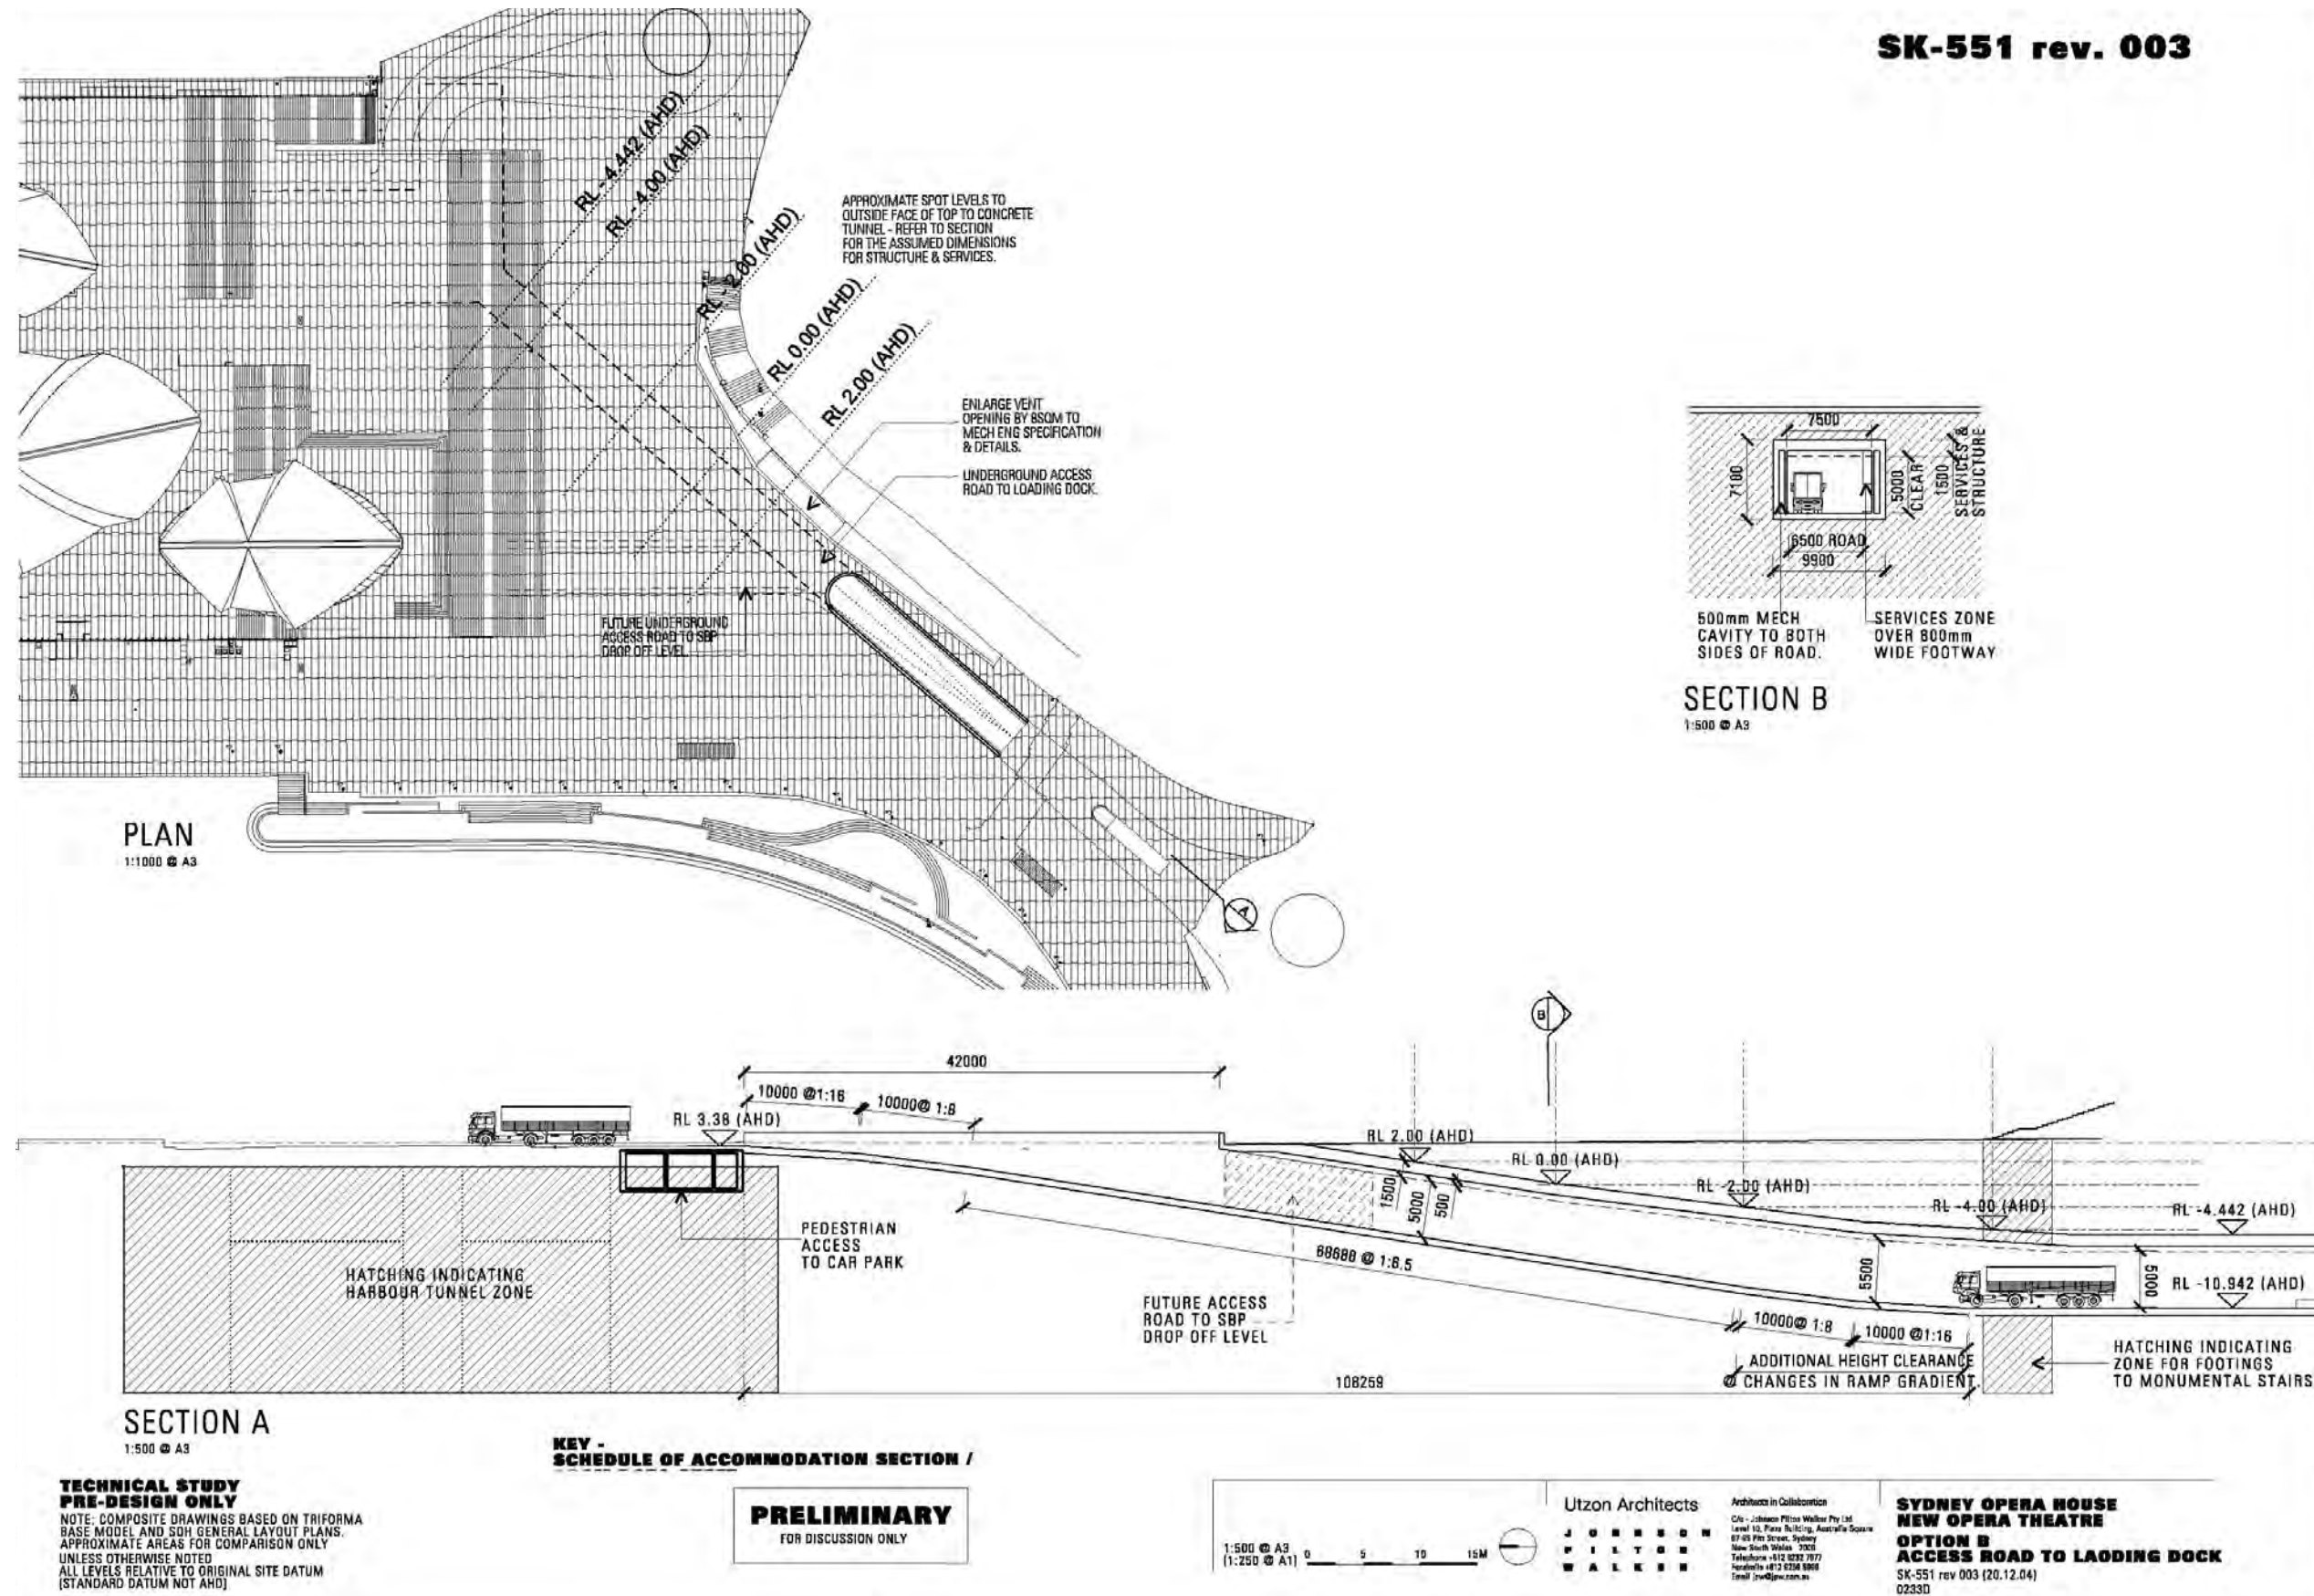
Plan and section drawings showing details of the proposed vehicular tunnel. (Source: Sydney Opera House Trust)
